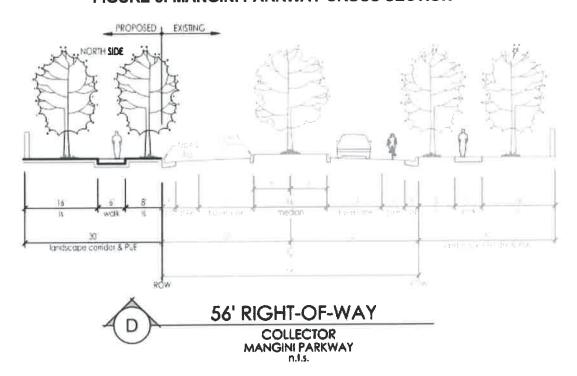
MANGINI PARKWAY CROSS SECTION
